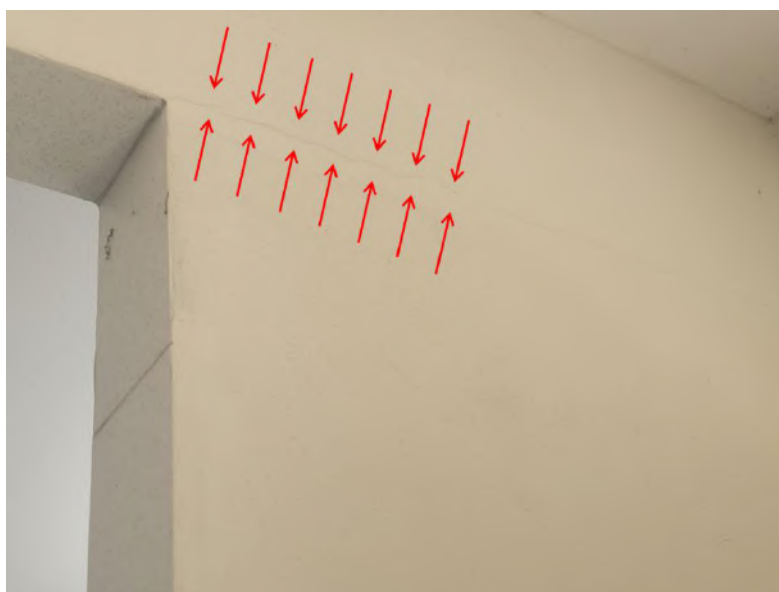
Vertical crack that follows the path of the longitudinal reinforcement.
